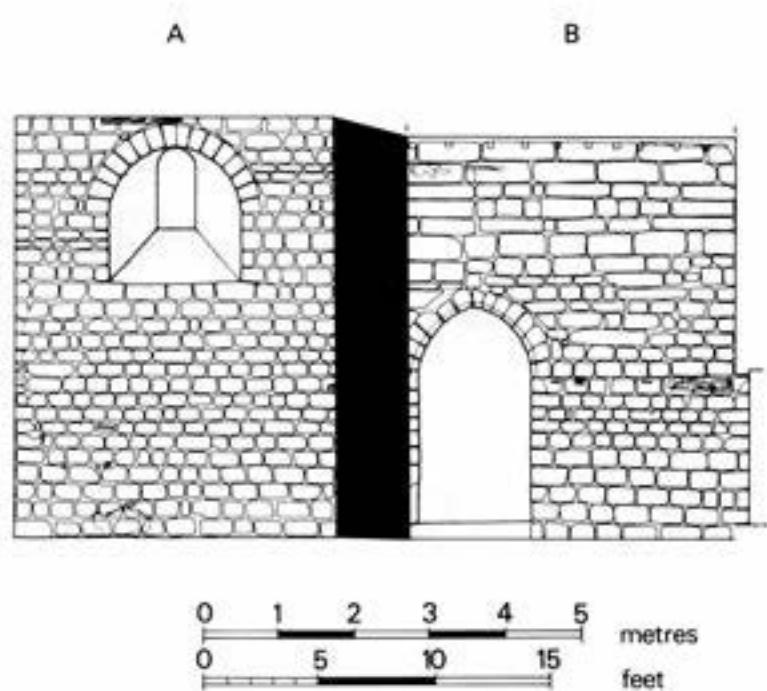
Elevation of the north wall of the first floor (A room 9; B room 8)
